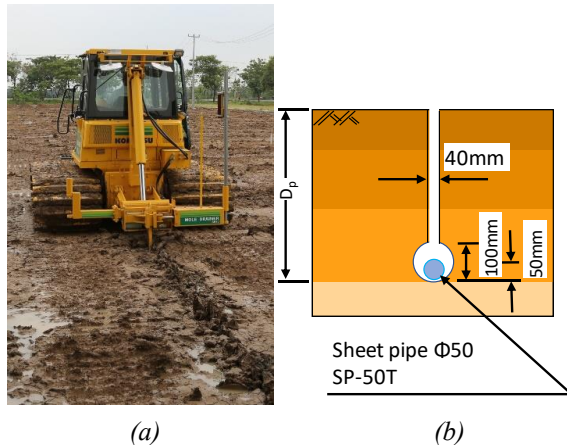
(a) Sheet pipe is under drawn into the ground, (b) Cross section of subsurface layer after the insertion of sheet pipe
